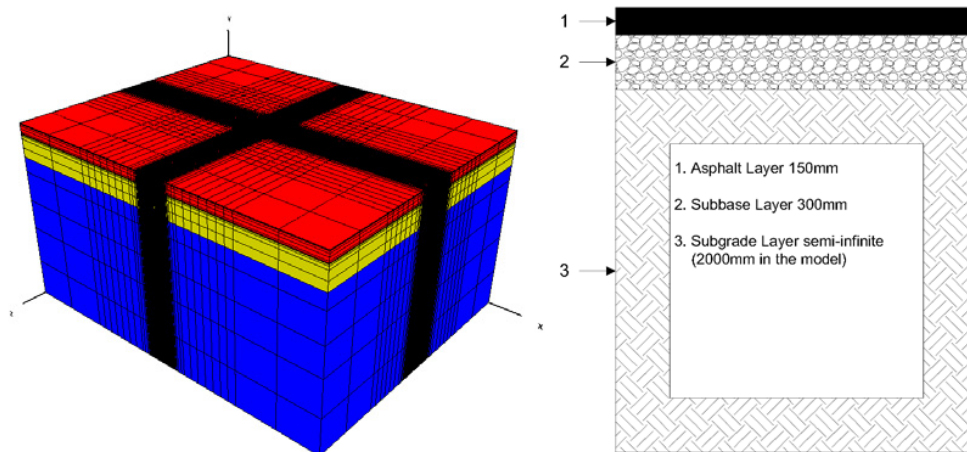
3-D image of the simple pavement structure and pavement structure.
